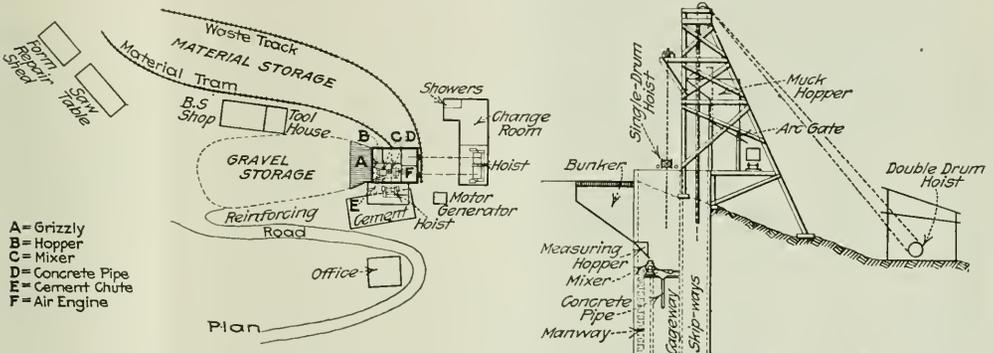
PLAN AND SECTION OF CONSTRUCTION-PLANT LAYOUT FOR SINKING AND CONCRETING MINE SHAFT
